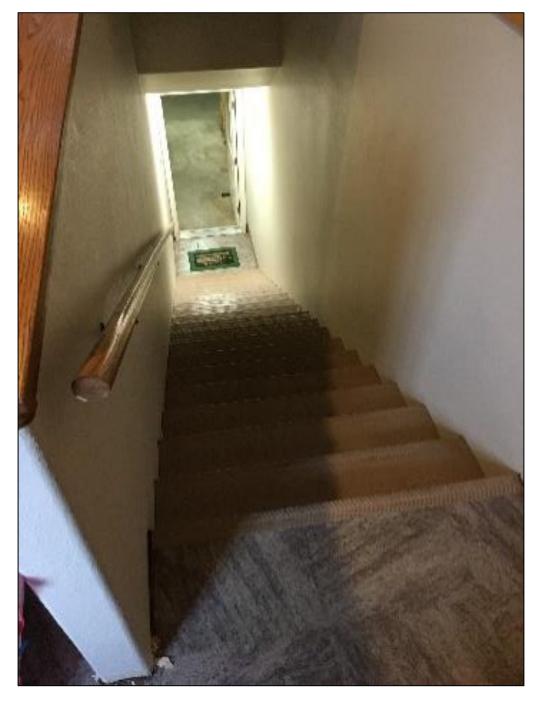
Fox Hills Clubhouse - Missing Handrail on Basement Stairs
